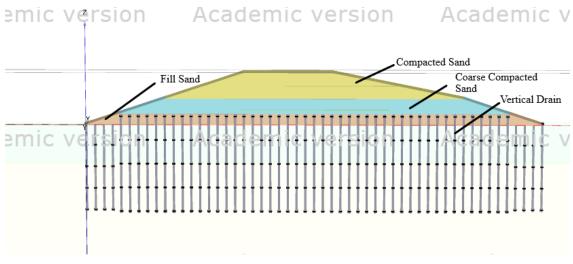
Modeling of embankment section (Refer to Figure: 4.17)
